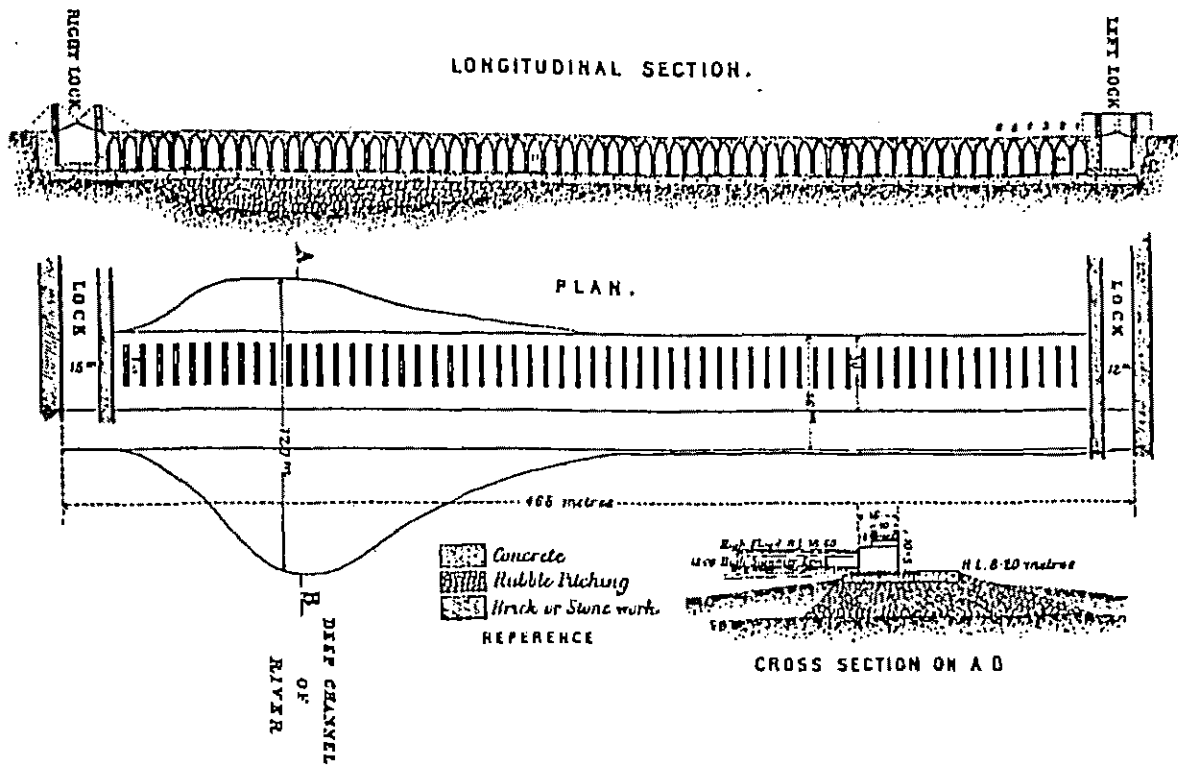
Rosetta Branch Barrage. Scale 1:1000.
